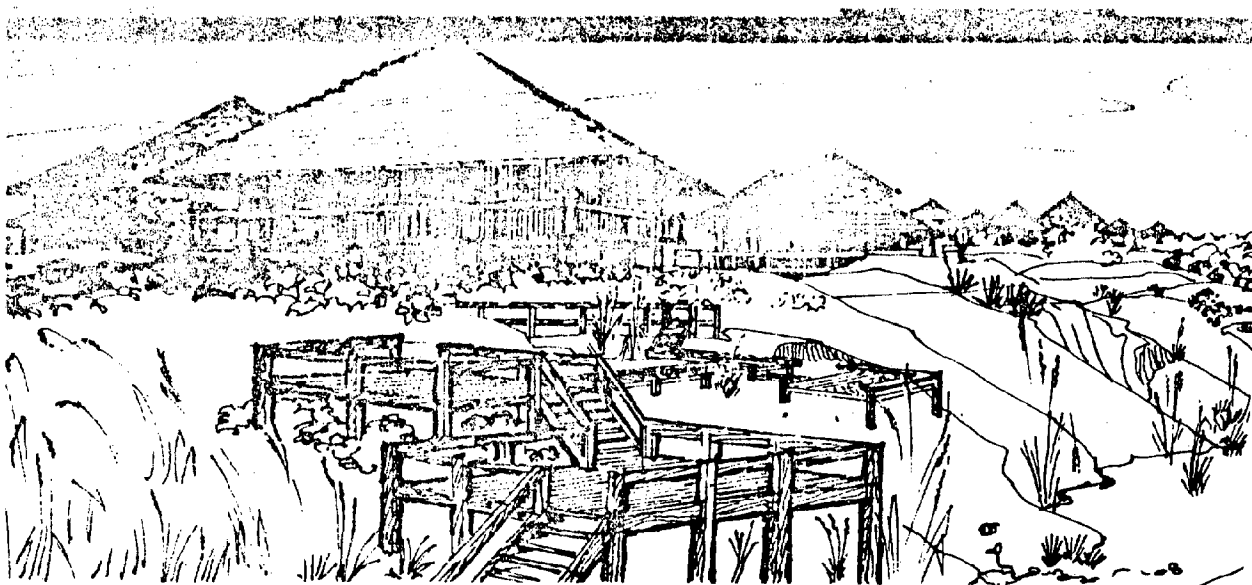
Concept sketch for non-alteration approach to building location and design where parcel configuration does not permit a full setback. [6]
